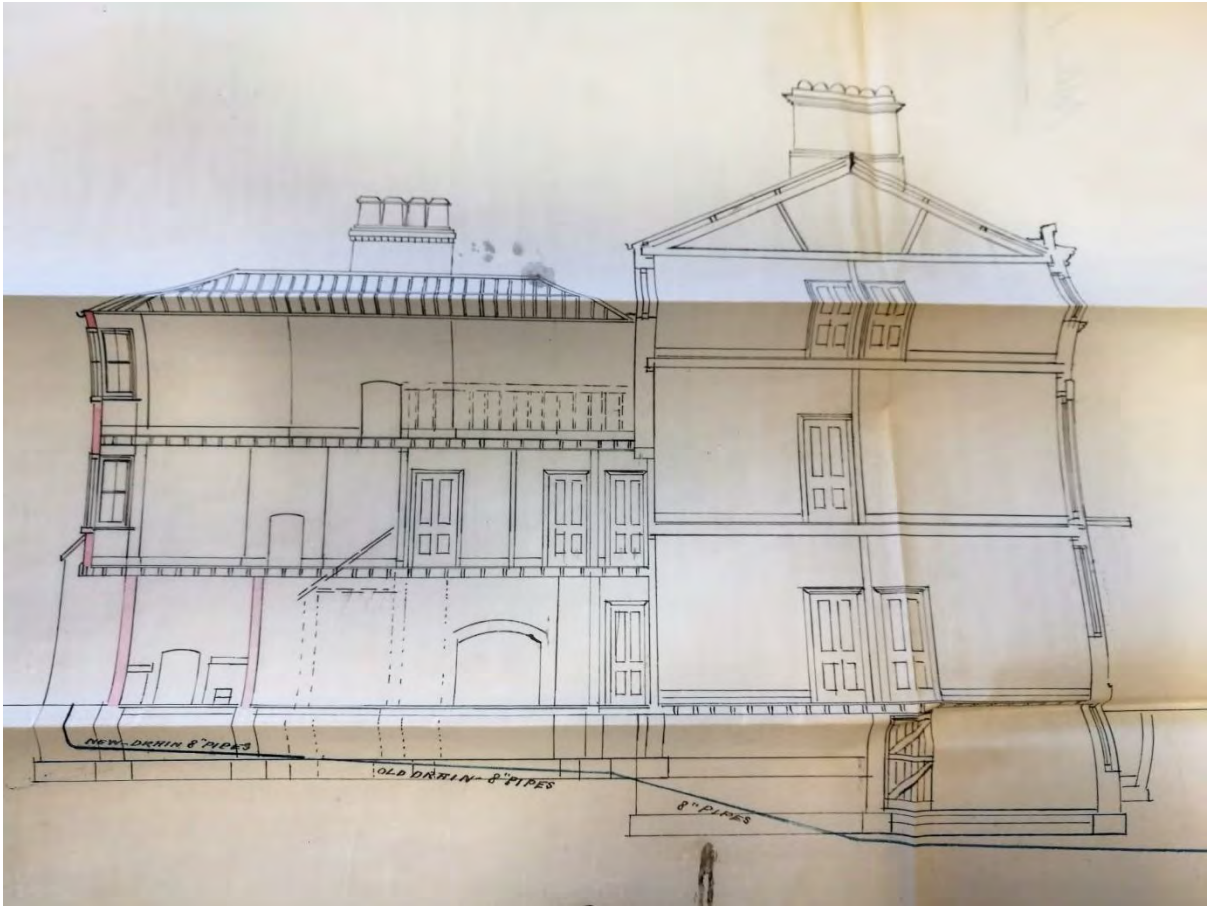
Original architect's designs, marked as No. 19 on the small plan showing house and garden. By W.D. Bleasley, architect, 22 Trinity St. Cardiff, for Mr. Lusty.
